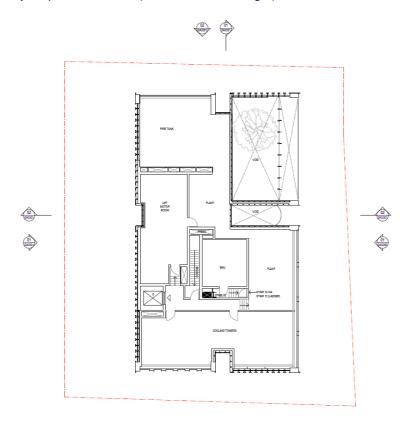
| Proposed level 59 (Source: Woods Bagot)
